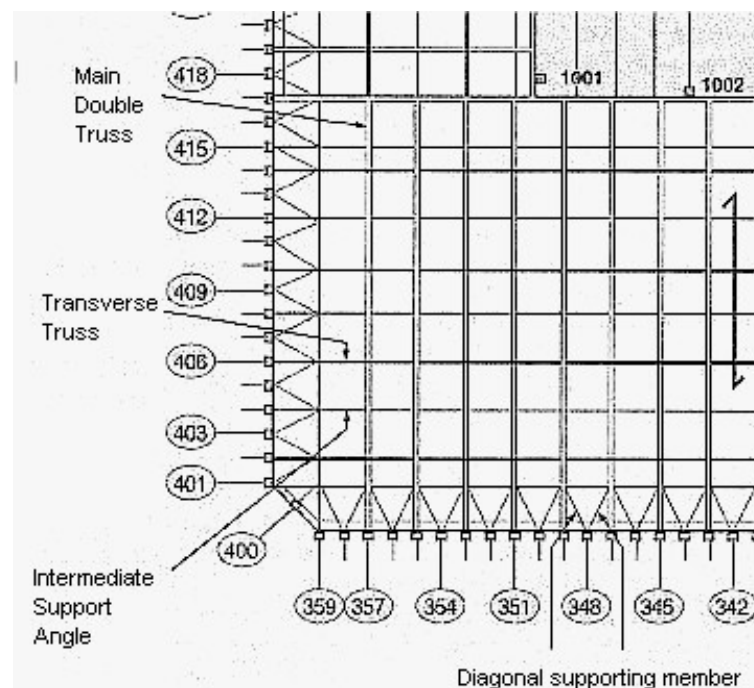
Representative structural framing plan, upper floor (FEMA, 2002)
